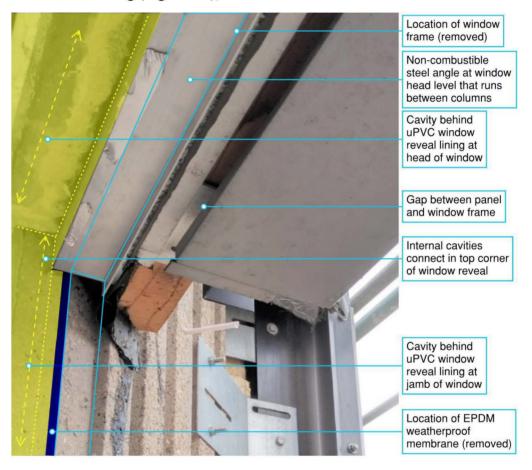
Cavities underneath window reveal linings at head and jamb of window and that they are connected.
